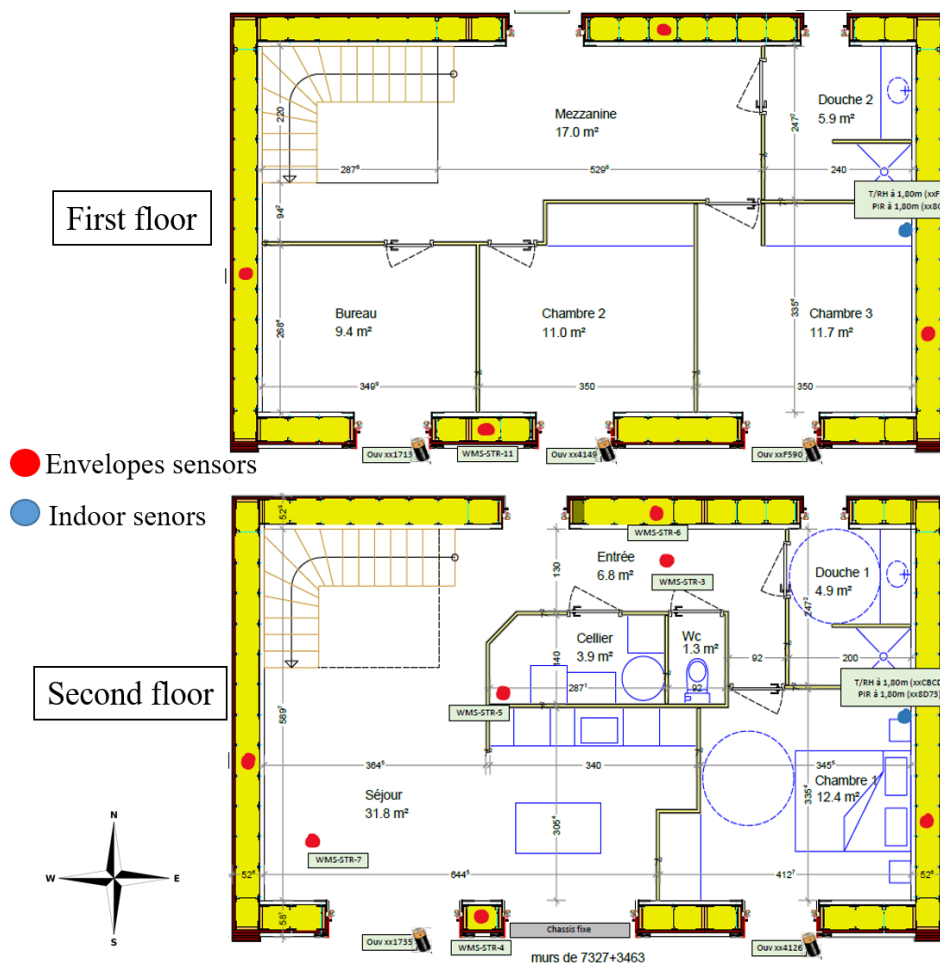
Drawing plan of the building with the location of the sensors (red and blue)
